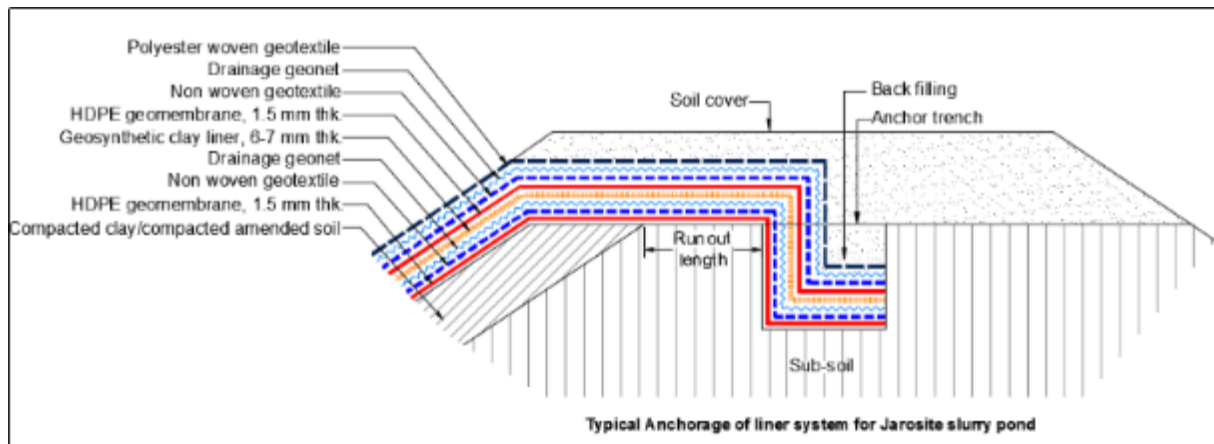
Typical anchoring of liner system for Vizag Jarosite pond
